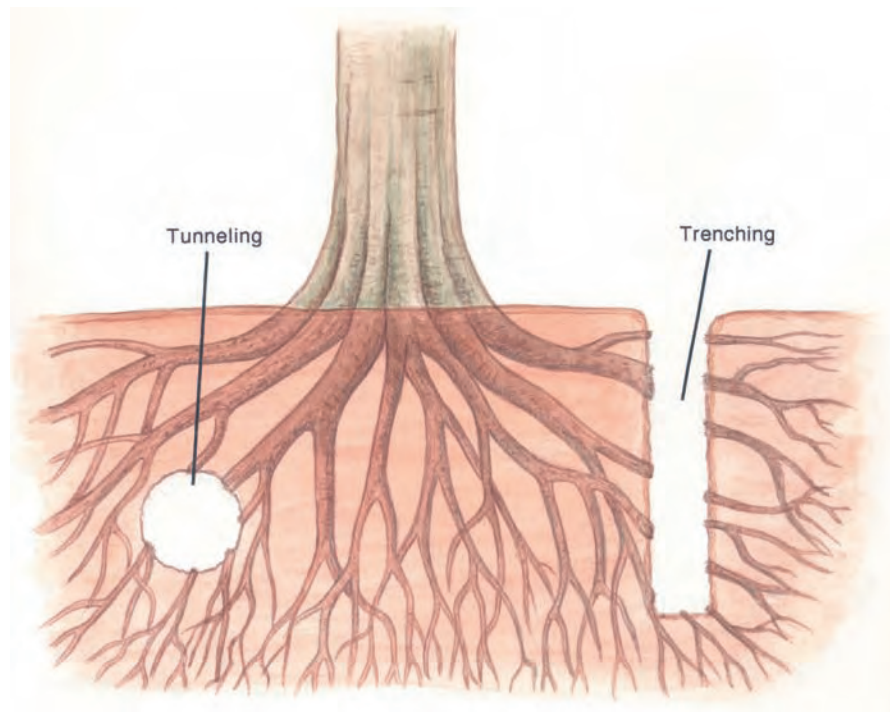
Underground utilities installed via a tunneling system cause less root damage than convention trenching operations.
